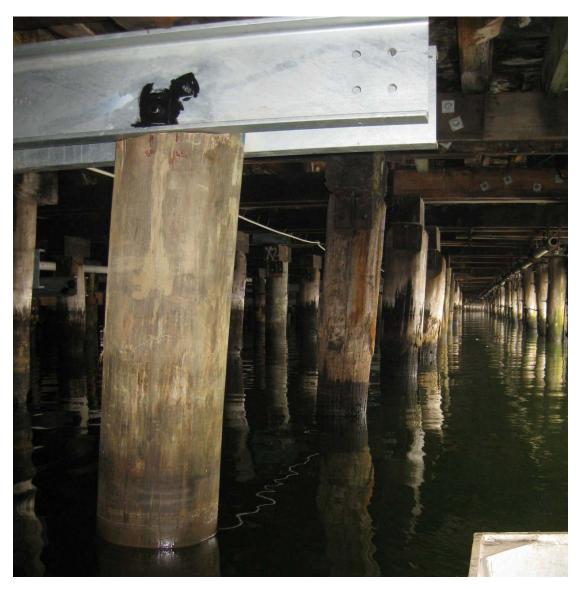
Under deck view to east, berth 10. Note new piles and galvanised channel beams (transfer beams) in foreground; and new timber beams with galvanised bolts in upper middle ground.
